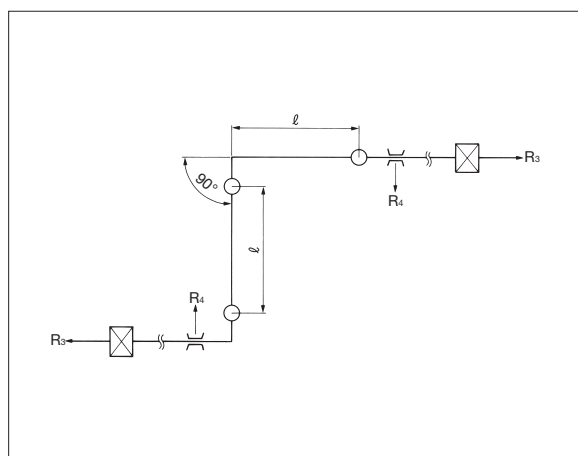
Connection of the UB type joints, anchoring points and guides (3)
